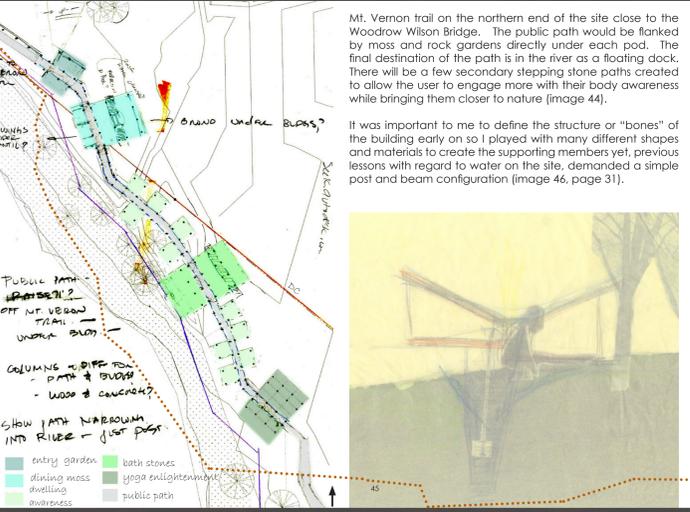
ground level plan showing the rock & moss garden under each pod, the round concrete column grid, the water collection basin, proximity to marshland, and one of the anchor points for the District's boundary line. Image 45 - sketch of yoga pose and building structure becoming one.
